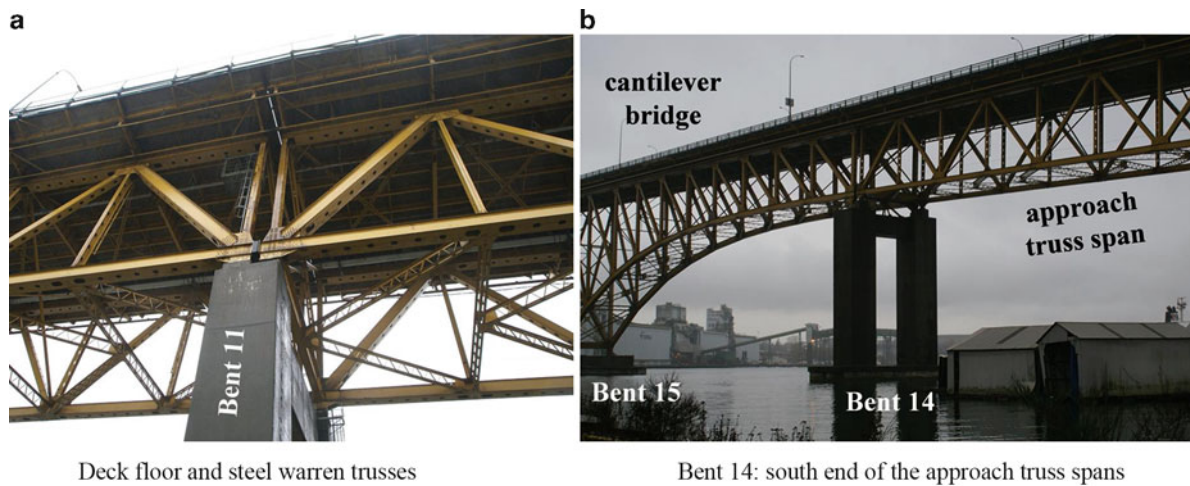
Approach truss spans, (a) Deck floor and steel warren trusses, (b) Bent 14: south end of the approach truss spans
